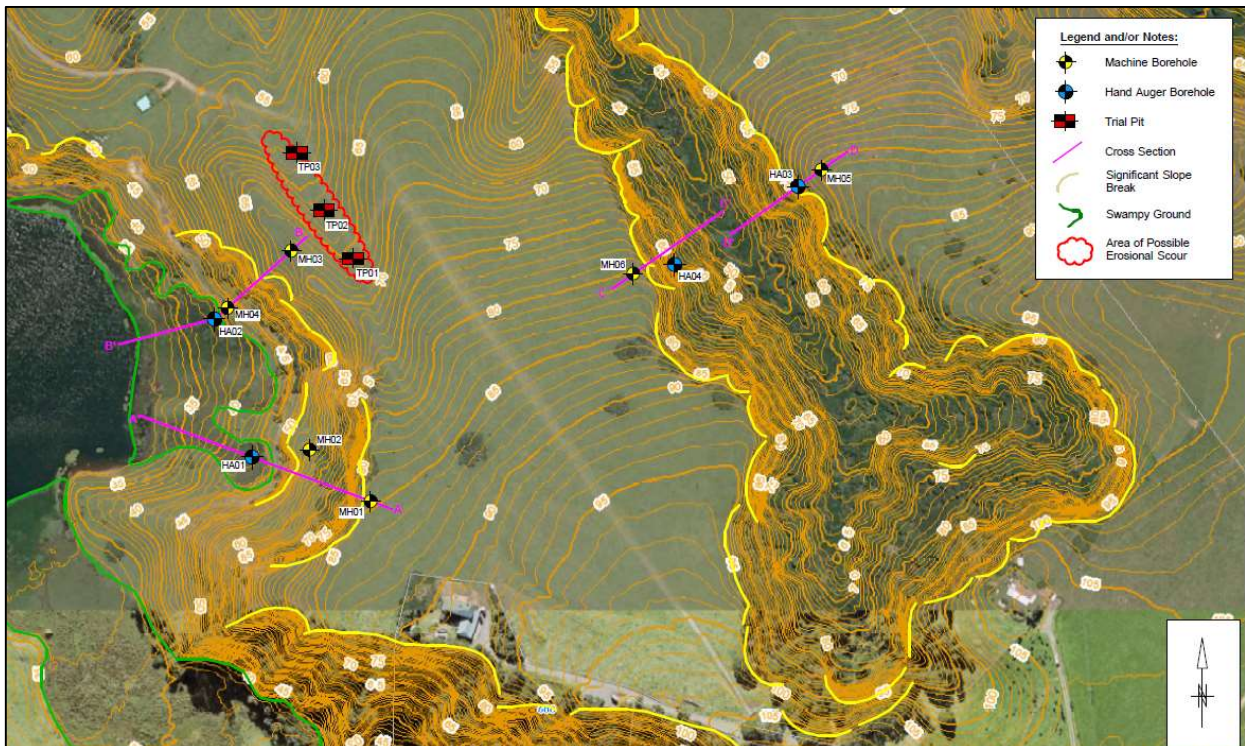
Site investigation plan (Source: Landers Geotechnical GIR)
